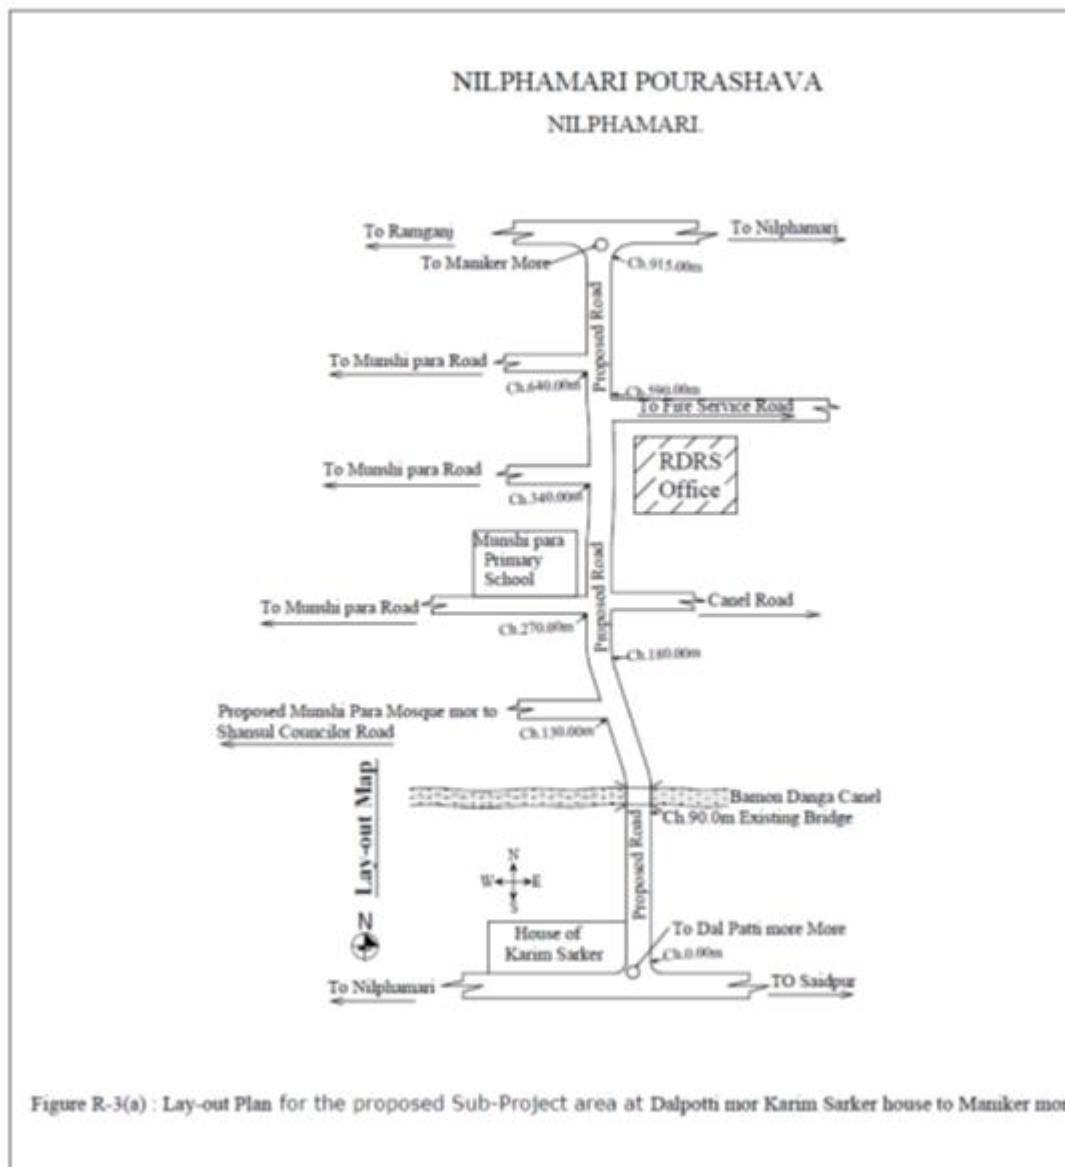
Layout Plan for the Proposed Subproject area from Dailpotti More Karim Sarkers House to Maniker More
